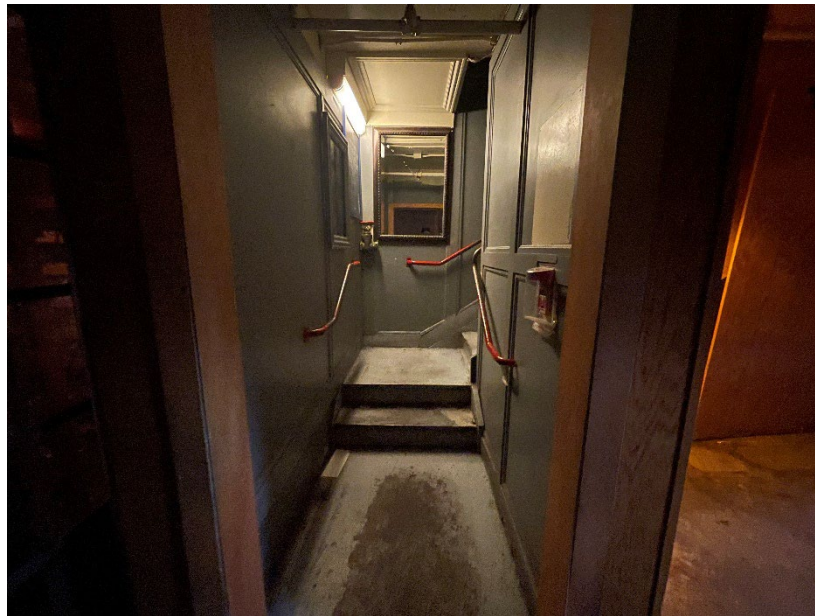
View of stairs leading to first floor from basement. (Photo taken by P&T 03/14/2025)
